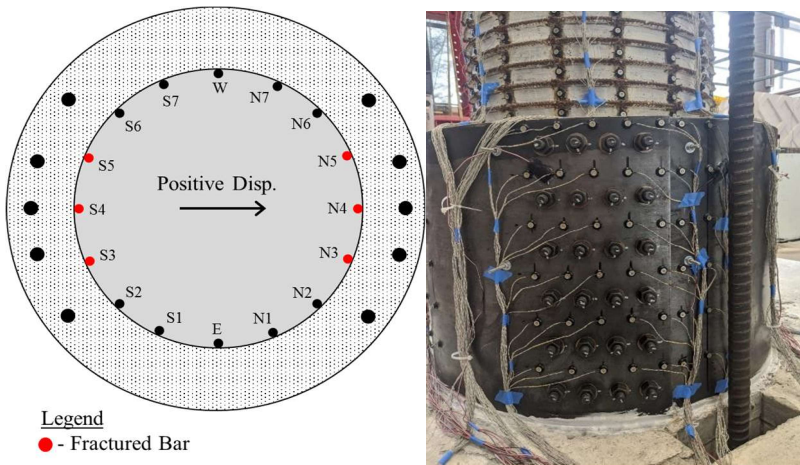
Repair cross section and bolt configuration for Repair #3.
